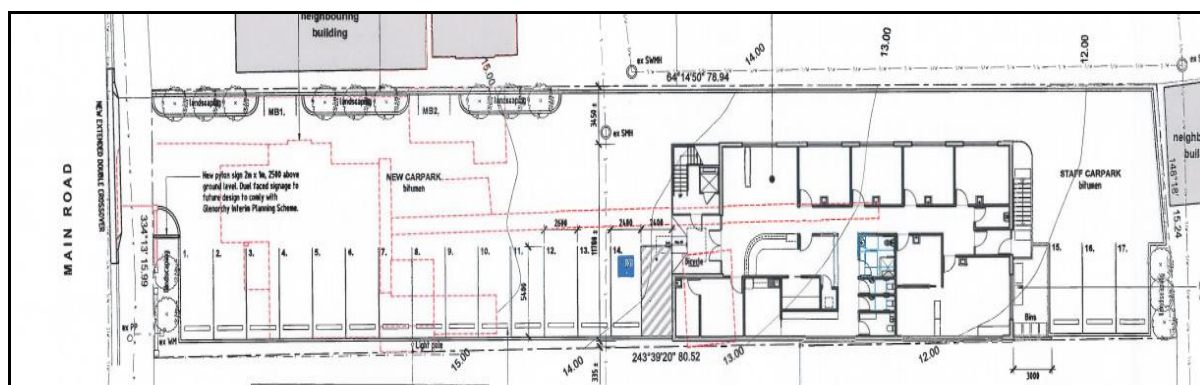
Proposal plan showing site layout and ground floor - Michael Cooper Architects
